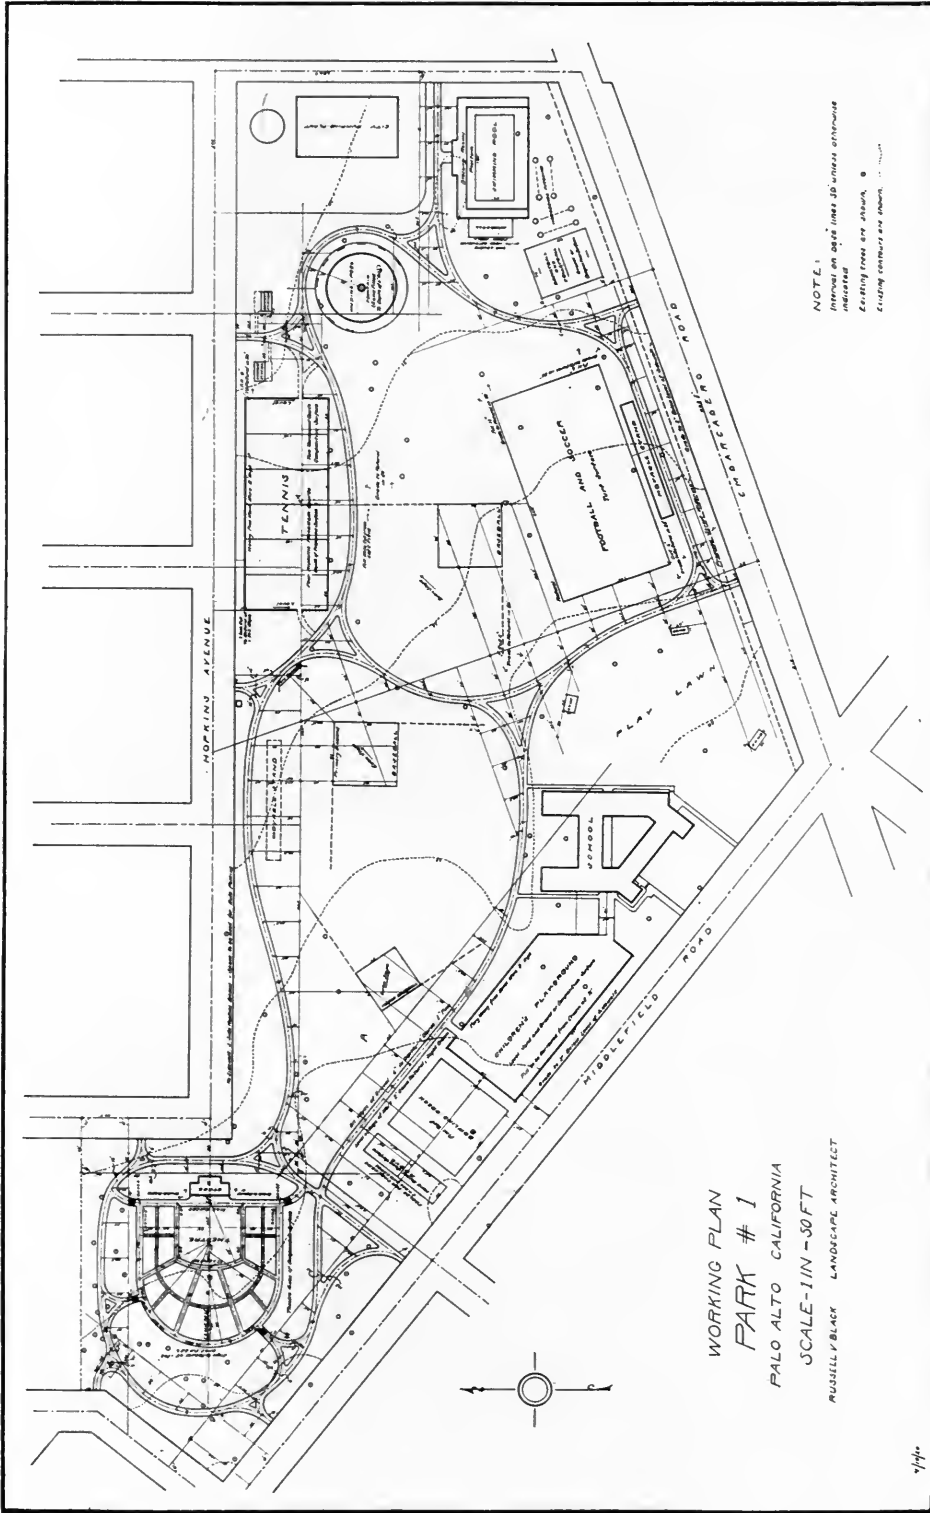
WORKING PLAN OF RICONADA PARK AND WALTER HAYES SCHOOL SITE, PALO ALTO, CALIFORNIA
